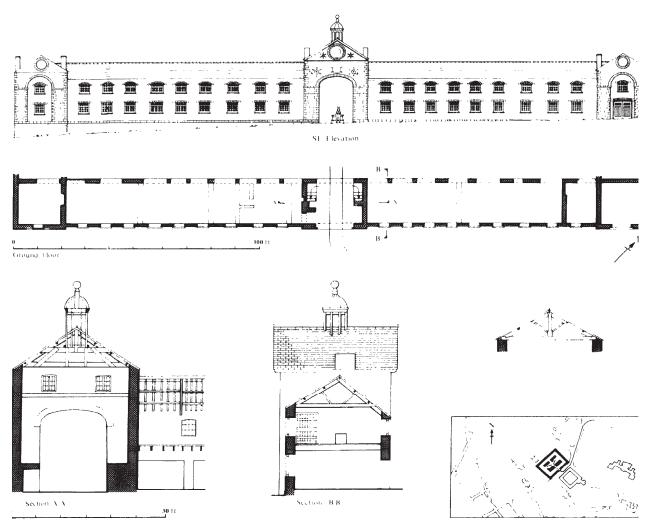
Plan and elevations of Dowlais Stables, Merthyr Tydfil. Inset: location plan
